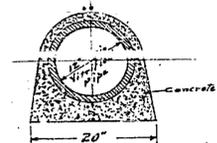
DETAIL OF GALVANIZED CORRUGATED IRON CULVERTS
